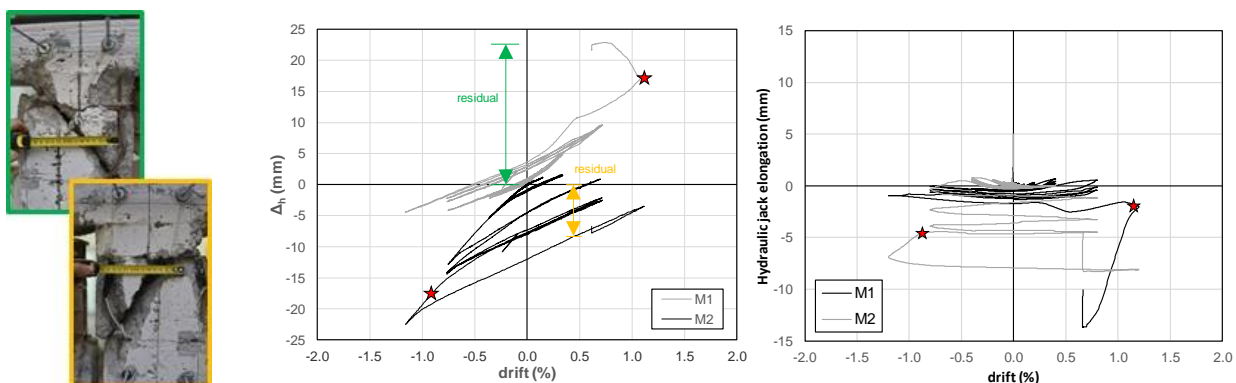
Specimen 150_3E: shear cracks horizontal component; damage state of the top columns at the end of the test (red star = “IAF”)
